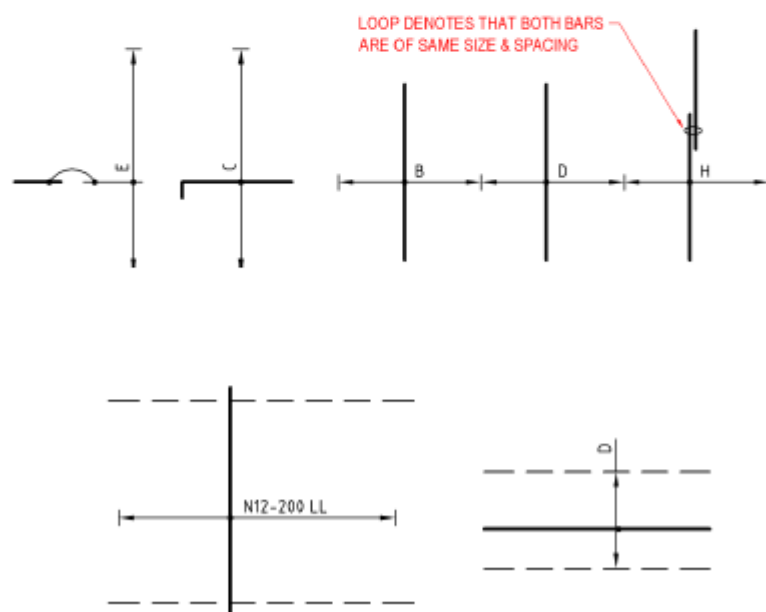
Reinforcement Example for Showing on Reinforcement Plans
